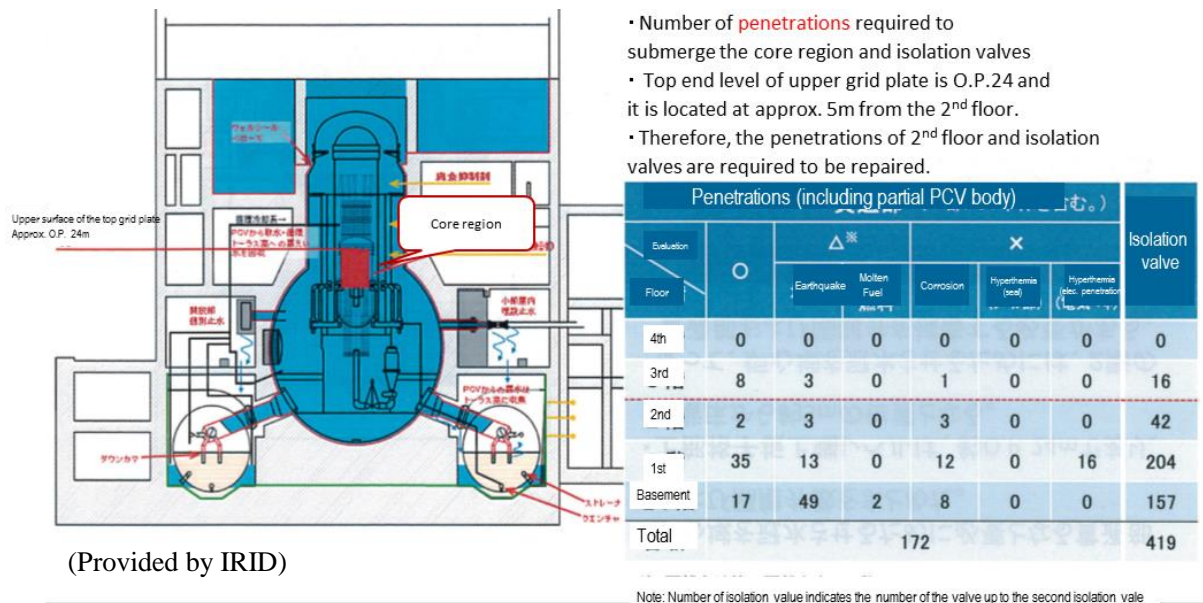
Possible damage area of each floor (Unit 2) (reference 2)
